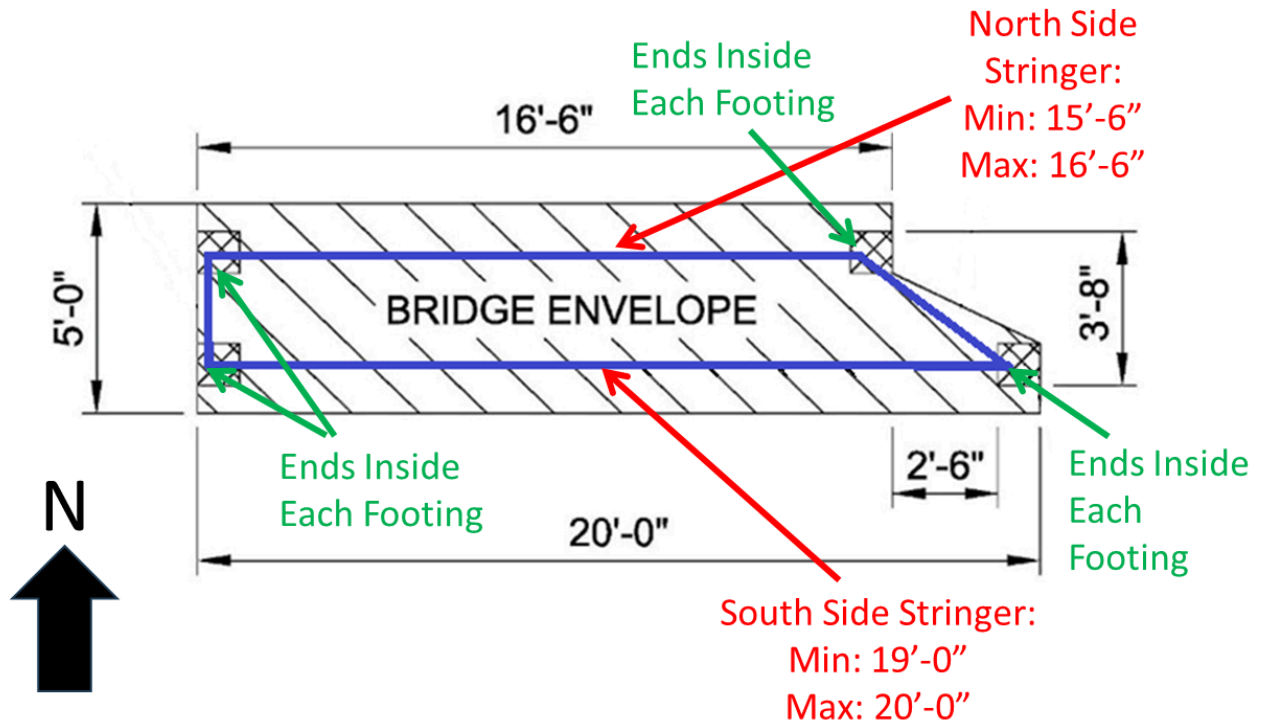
Plan view of the bridge showing viable stringer lengths that fit within the bridge envelope and end inside each footing. The members running between the north and south footings on each end of the bridge are not stringers.
